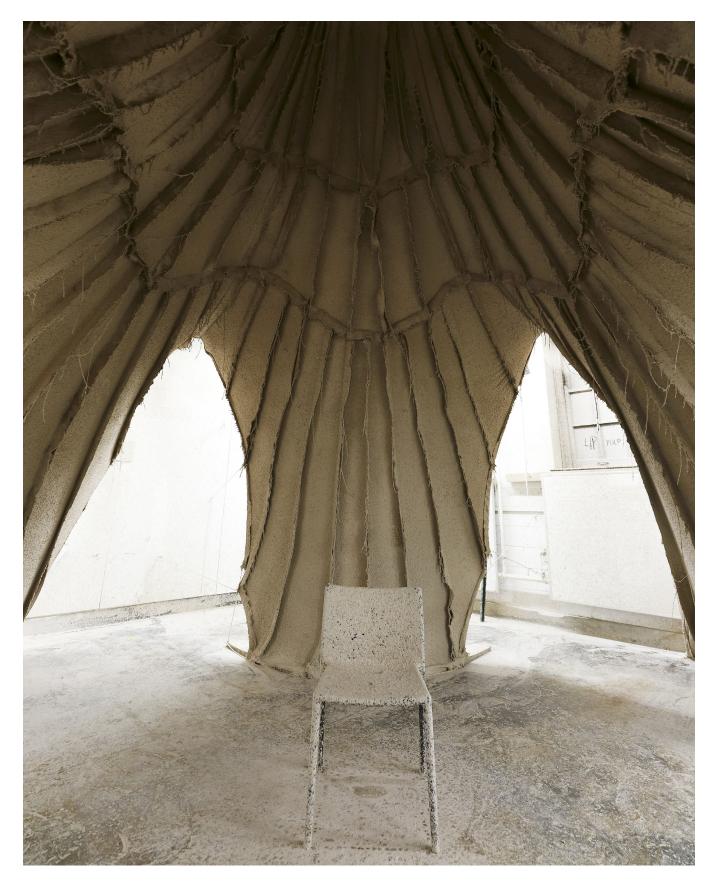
Interior of room scale cast paper structure made using a suspended fabric formwork. Photograph: Georg Rafailidis.
